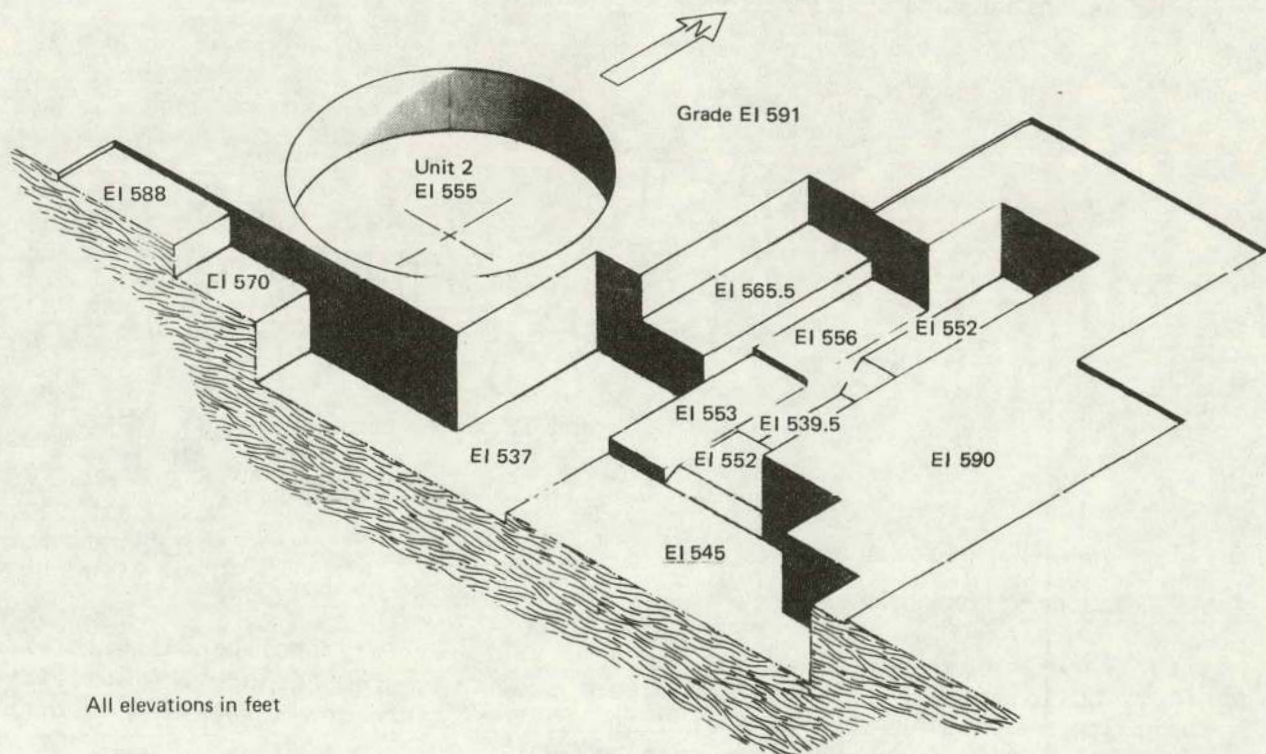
Isometric view of the Zion foundation excavation configuration.
